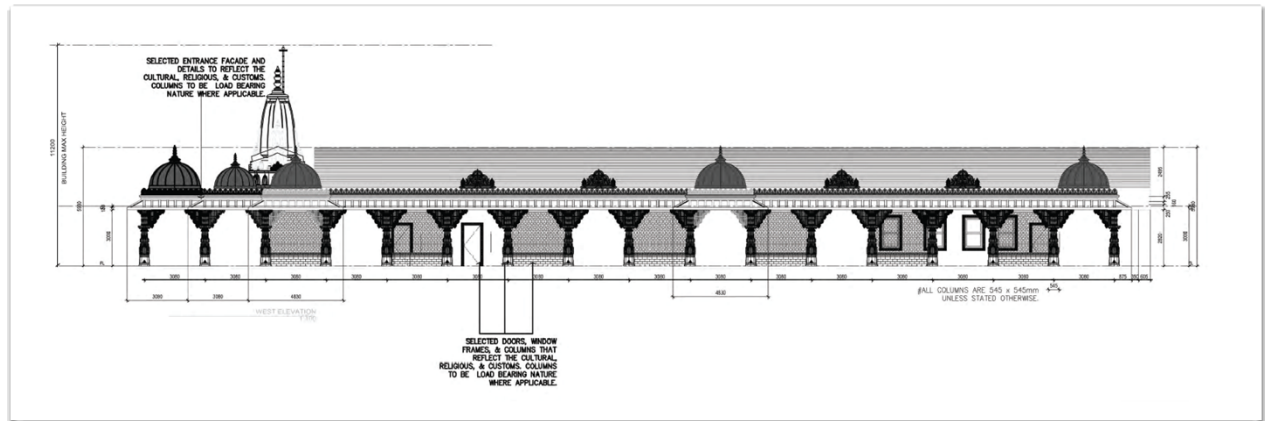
Proposed side elevation. Source: Application plans submitted 13/09/2021
